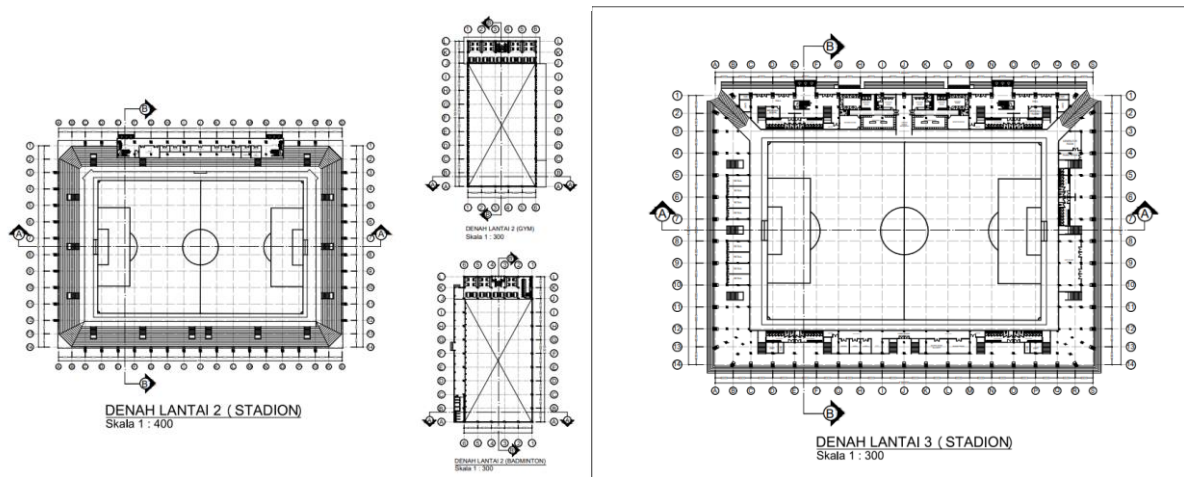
(a) Second Floor plan; (b) third floor plan. (Source: Author,2024)
